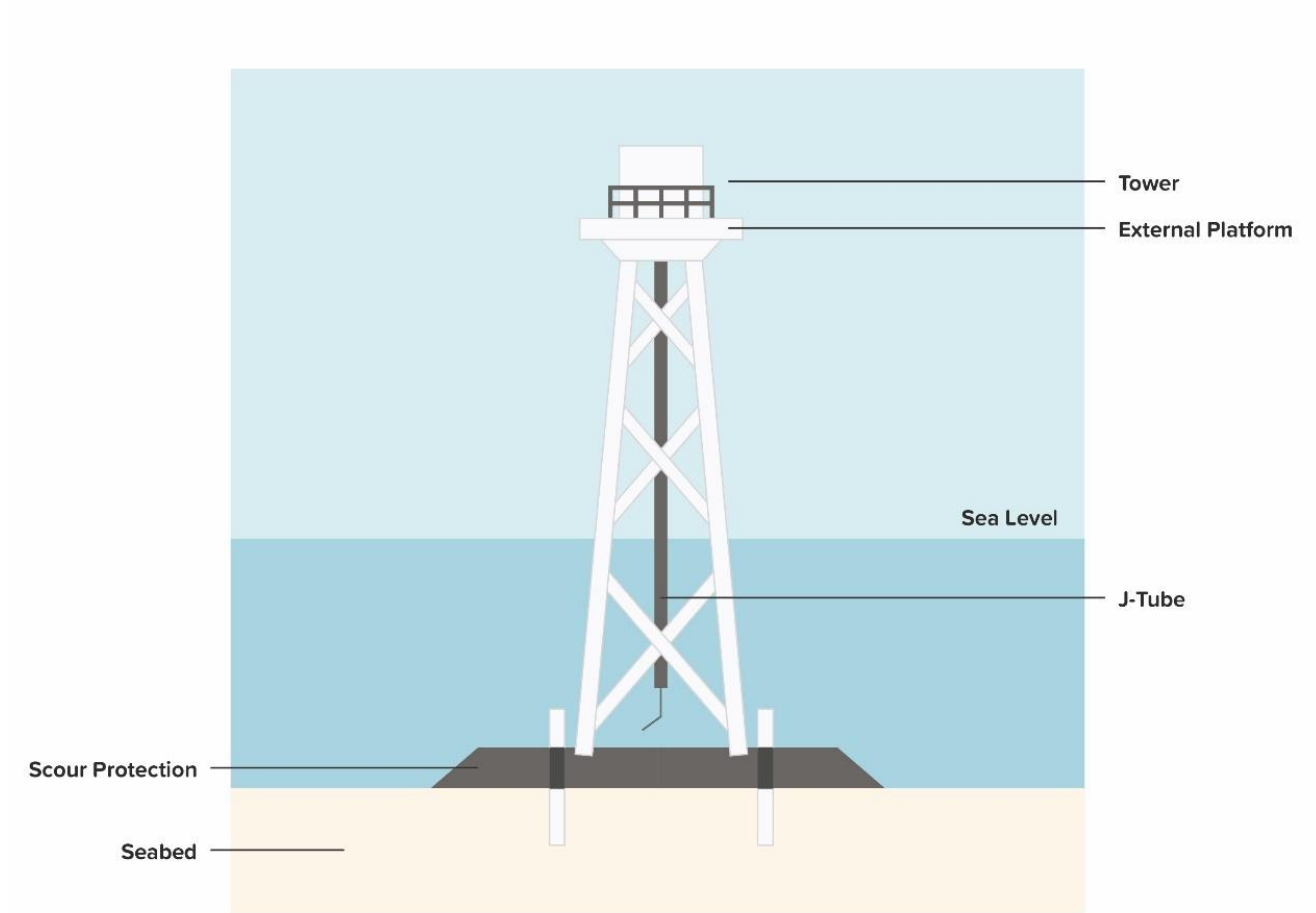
Indicative Piled Jacket Foundation Schematic
